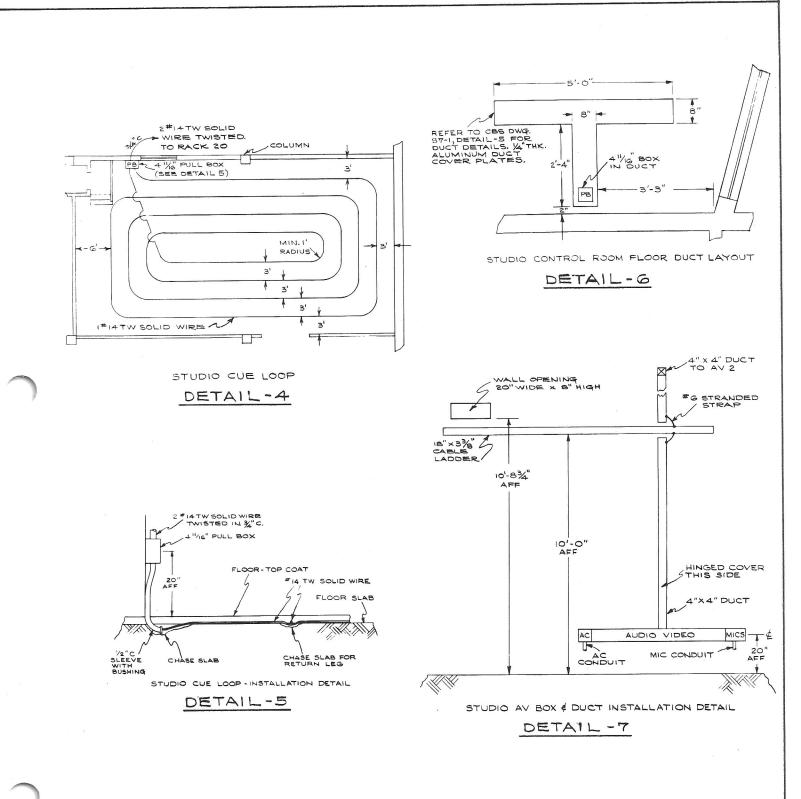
Installation details of a portion of the technical area of a television plant.
